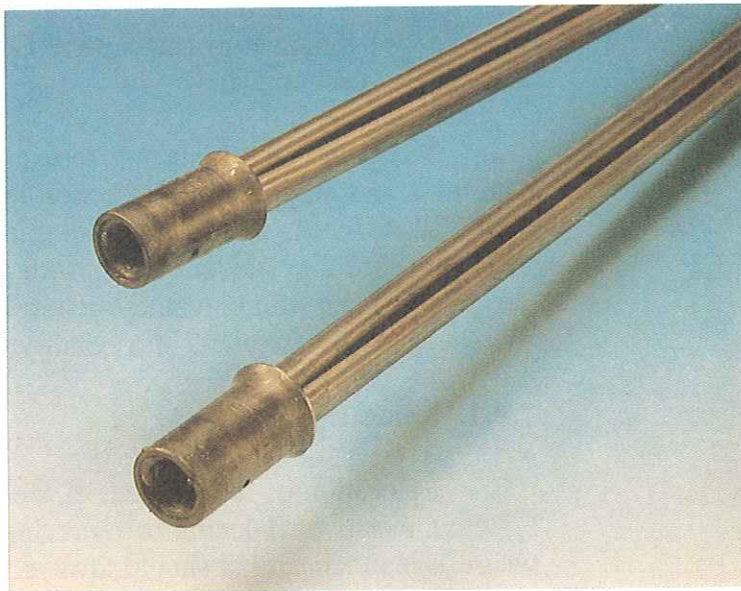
Swellex rock reinforcement system. Used for temporary, short term or emergency stabilization. Sections can be added together to develop bolts 20 to 30 feet long (*Courtesy Atlas-Copco*).
